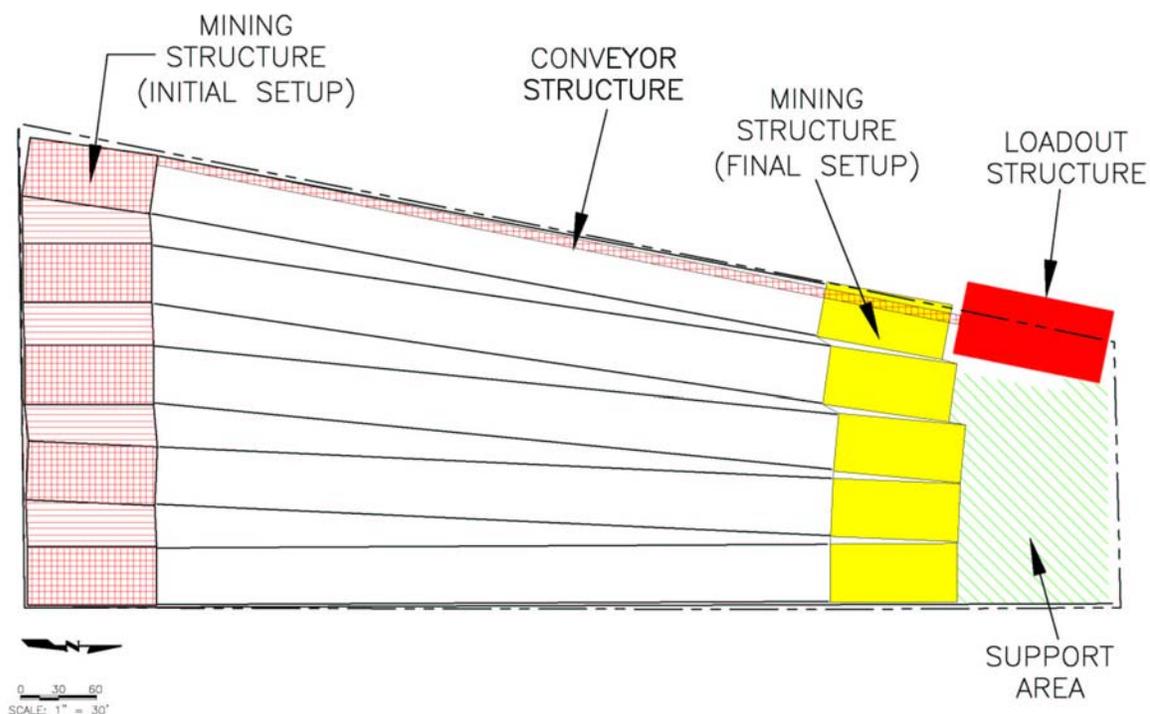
Plan View of Trapezoidal Site with Project Structures Shown
